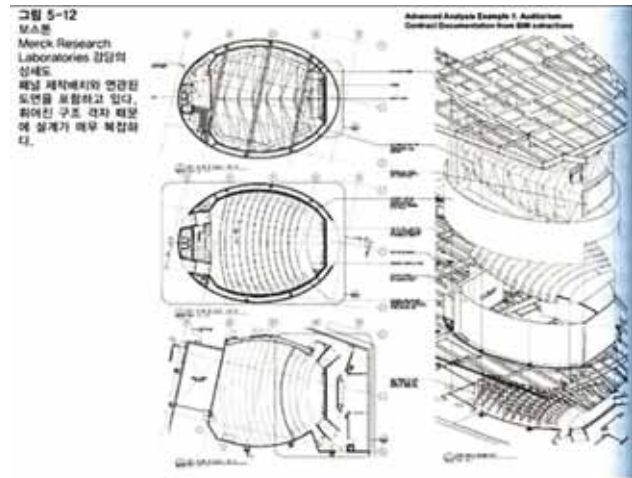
Detail layout associated drawings. A view of a design engineer has included panel fabrication. Takla structure model.
